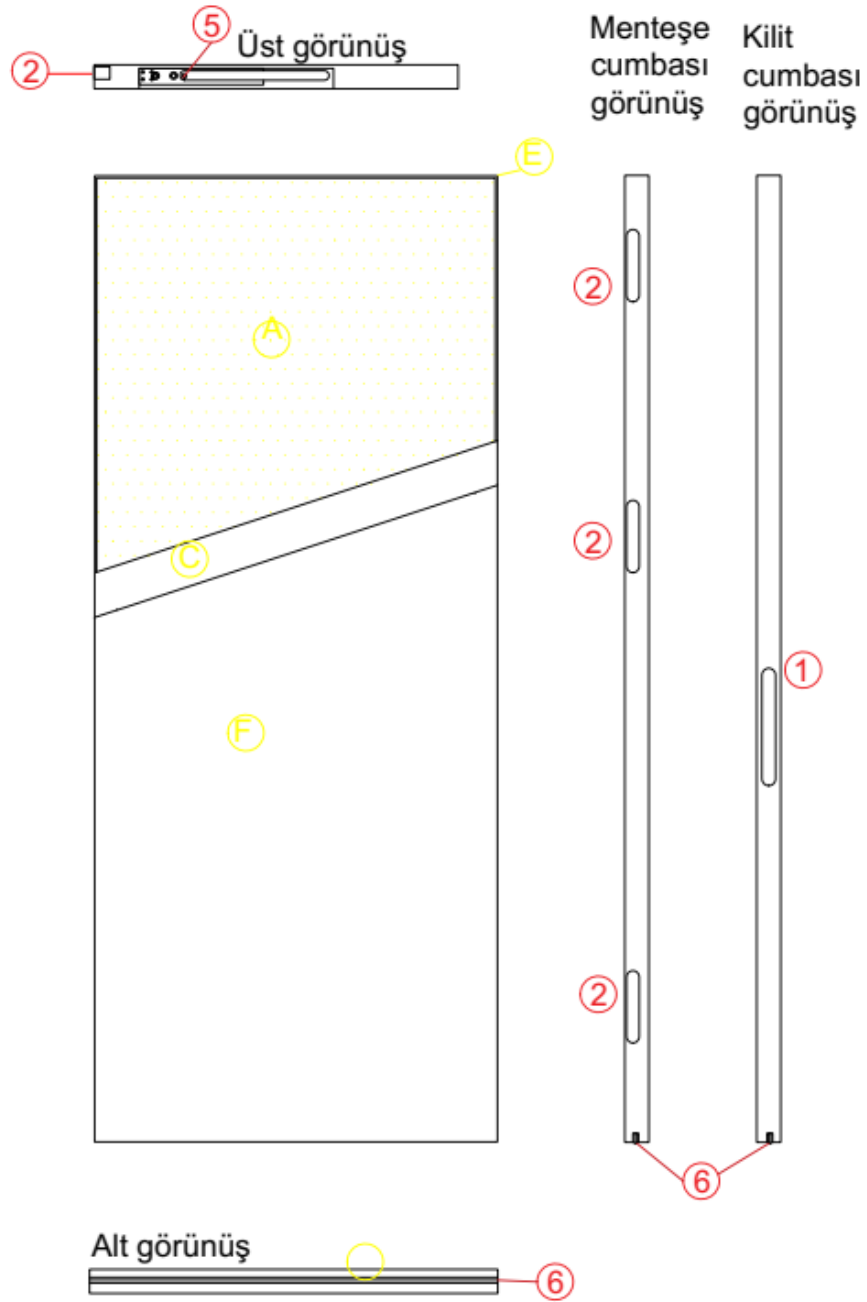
Leaf details of the Door Nr.1 and the Door Nr.2.
